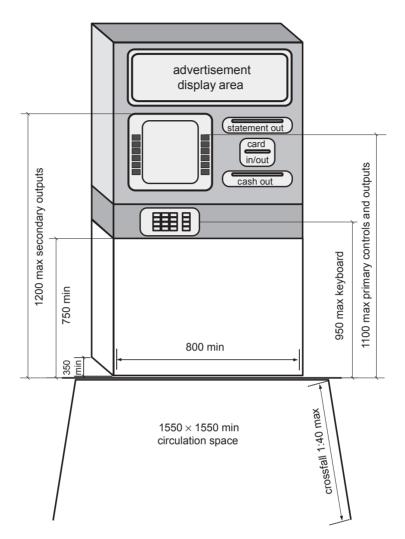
Automatic teller machine (ATM) dimensions recommended in the Australian standard [12].
